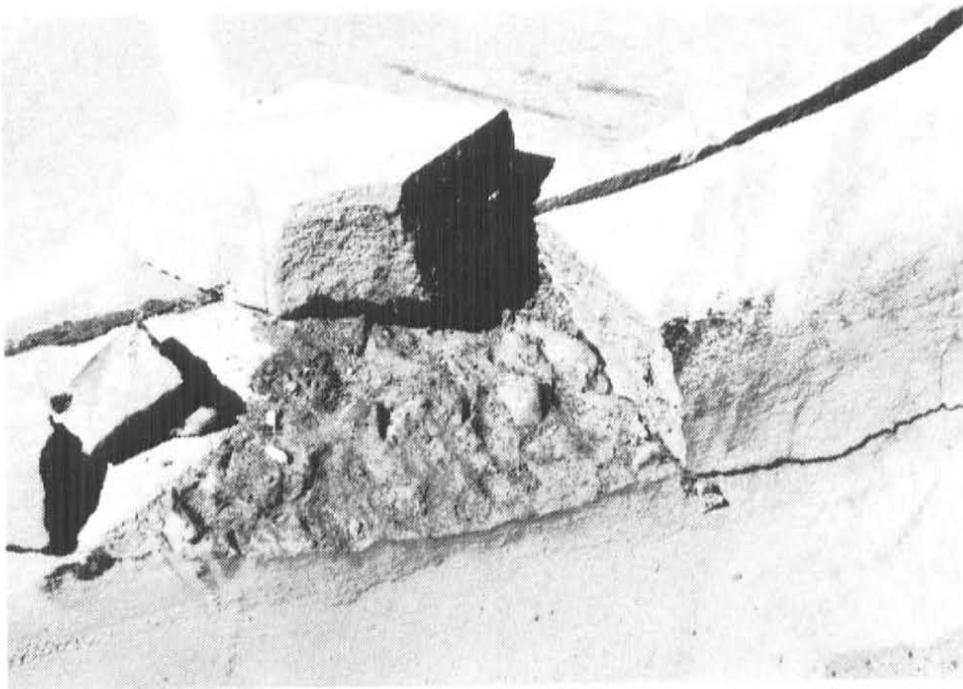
SPALLING OF THORITE CURB PATCH
